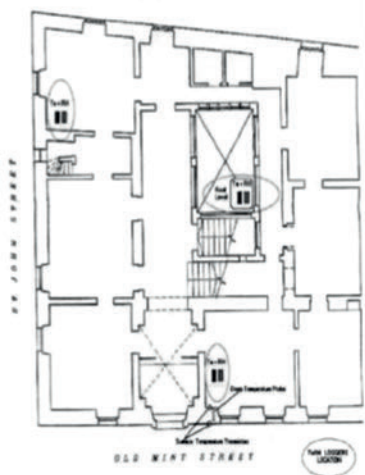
Building 3: 36, Old Mint Street, Valletta
